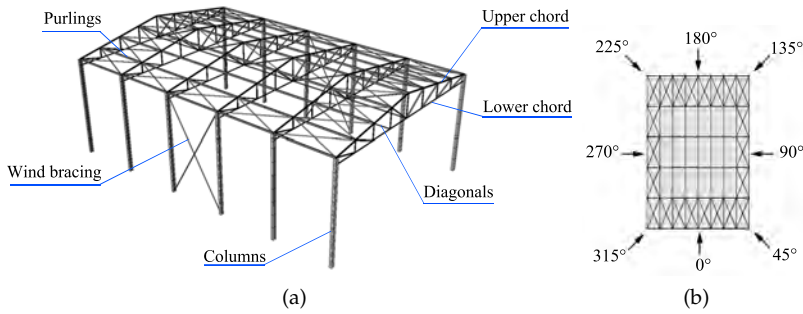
Structure of the building: (a) perspective view, (b) plan view (adapted from Patruno et al. [127]).
